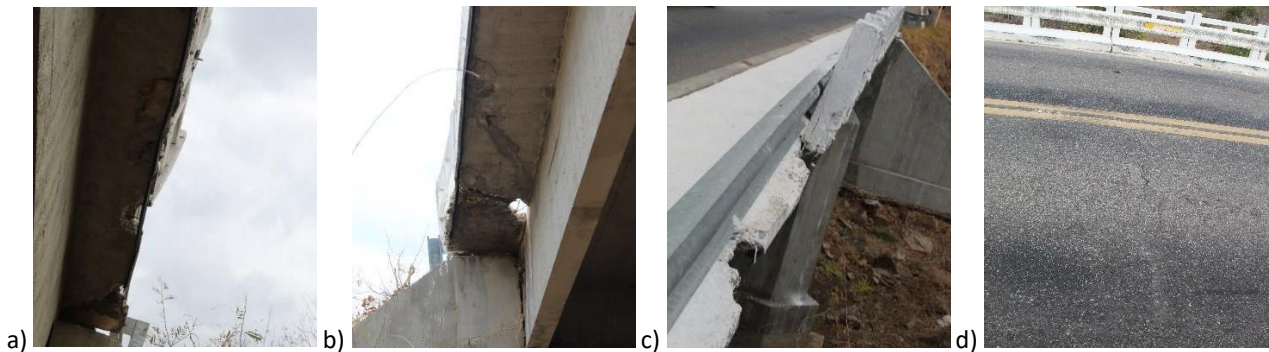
Unrepaired damage to the bridge: a) Damage to the left flange of the slab; b) Damage to the right flange of the slab; c) Damage to the reinforced concrete guardrail; d) Damage to the asphalt pavement due to missing or inadequate expansion joint
